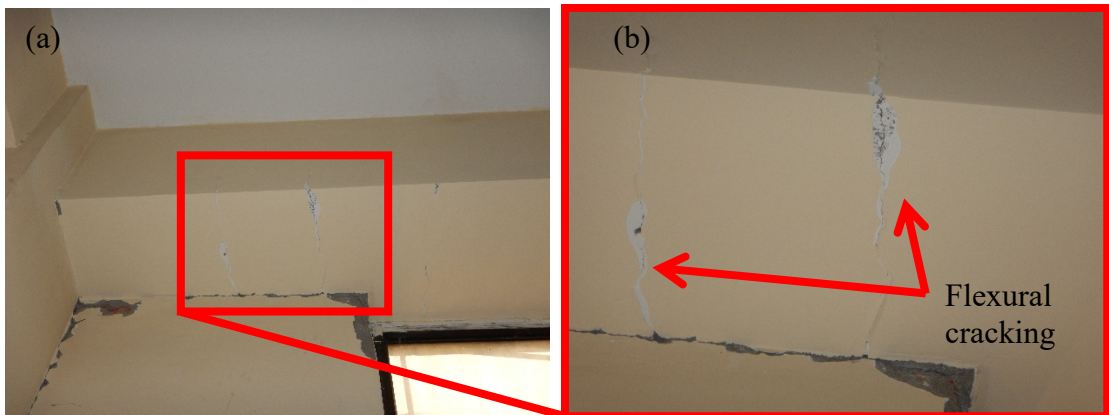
CTC Mall – beam flexural cracking: (a) overall view; (c) close-up view.
